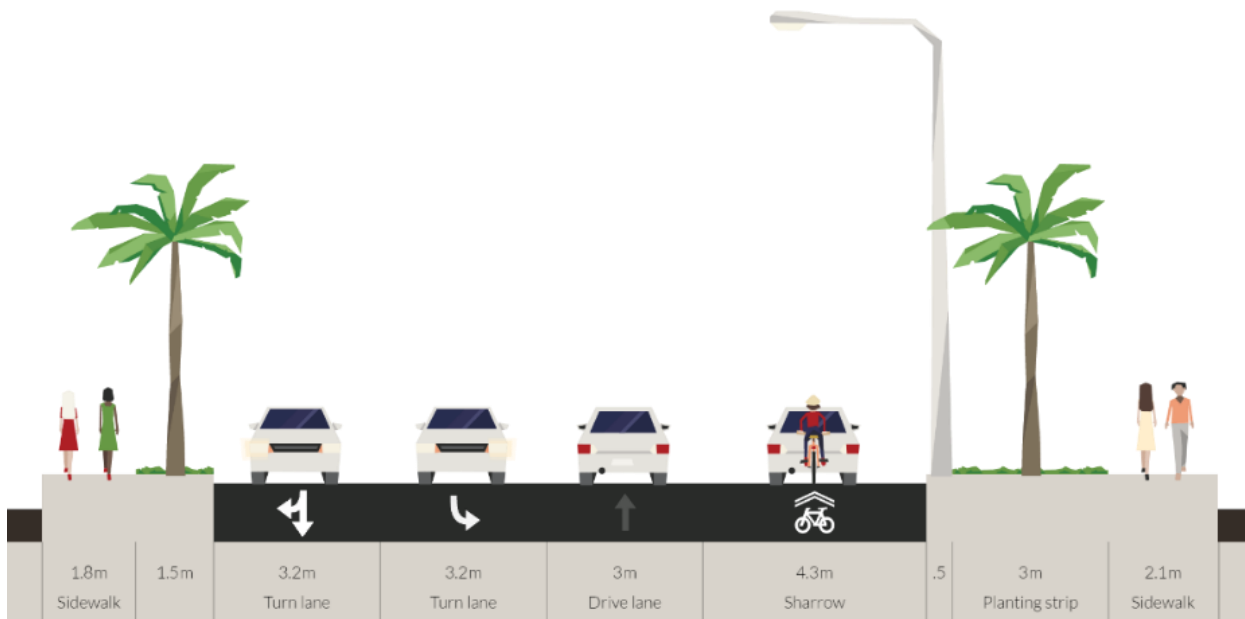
Recommended Cross-section of Church St. at Doris Ave. (Looking West)
